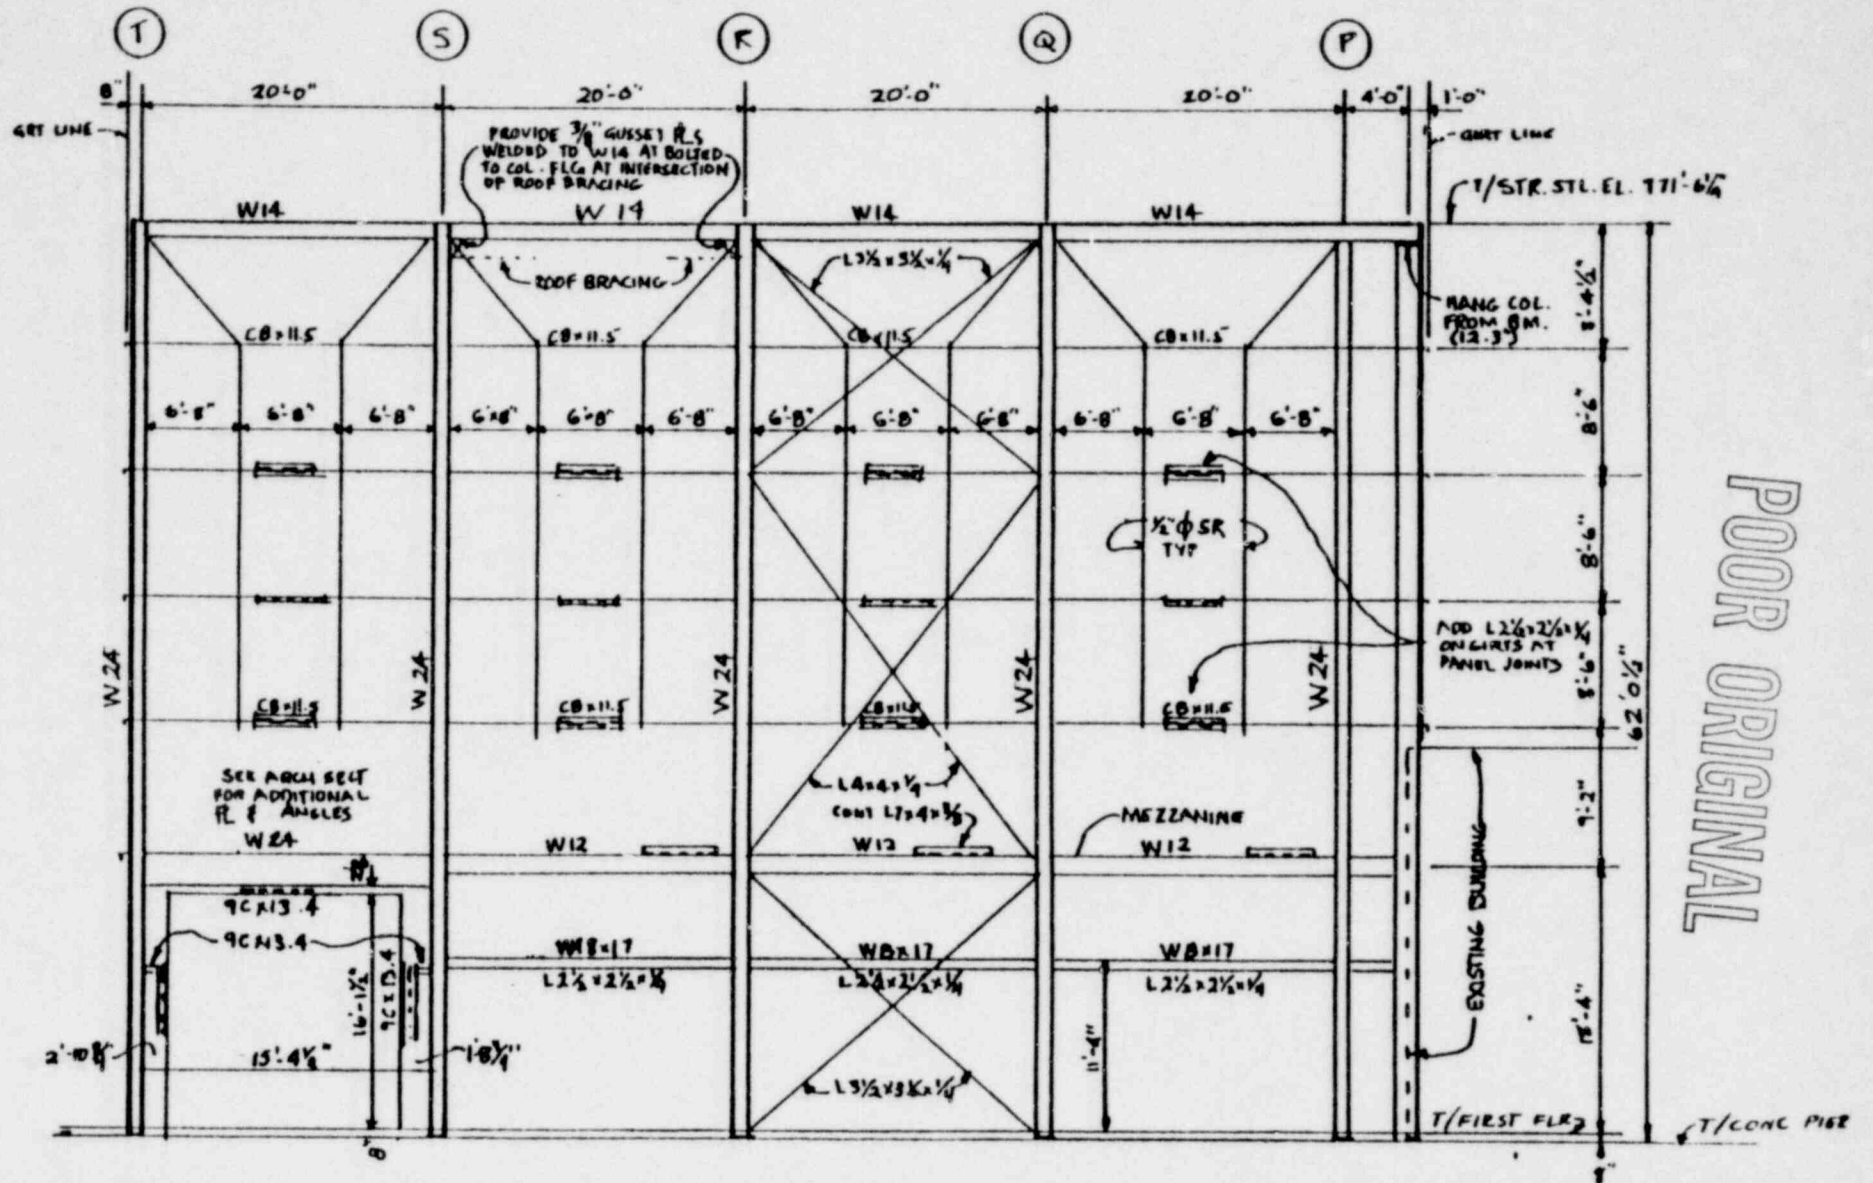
JN-1B SOUTH WALL FRAMING ELEVATION
